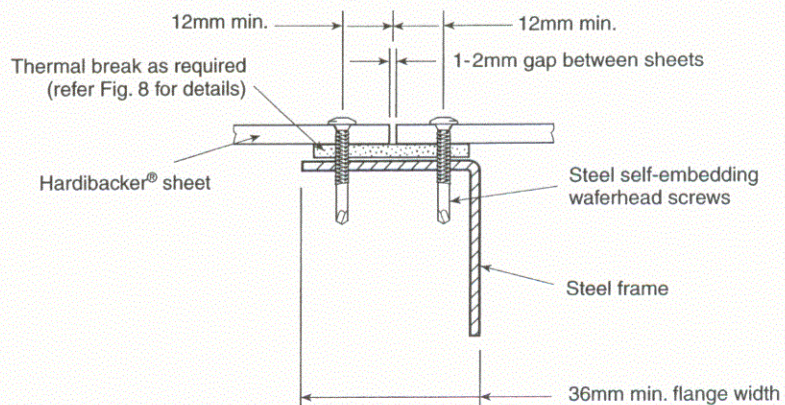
HORIZONTAL FRAME AND SHEET SET-OUT TO NARROW-FLANGE STEEL FRAMING
